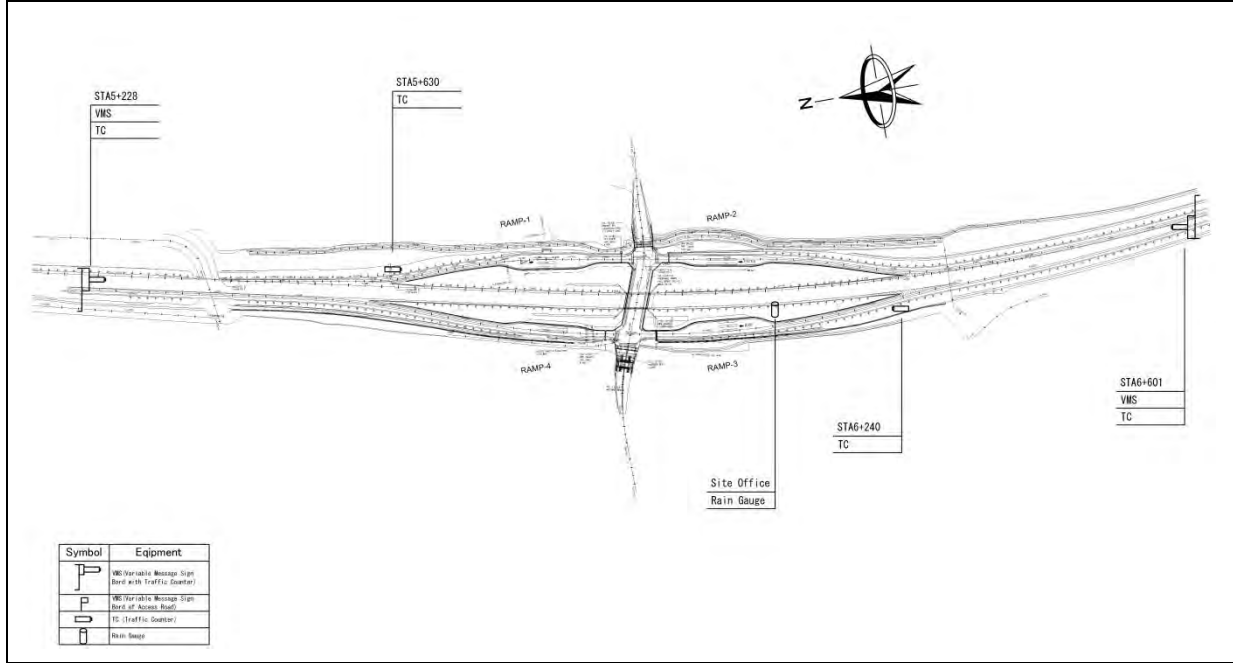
Road side equipment layout plan (Kahatuduwa IC)
